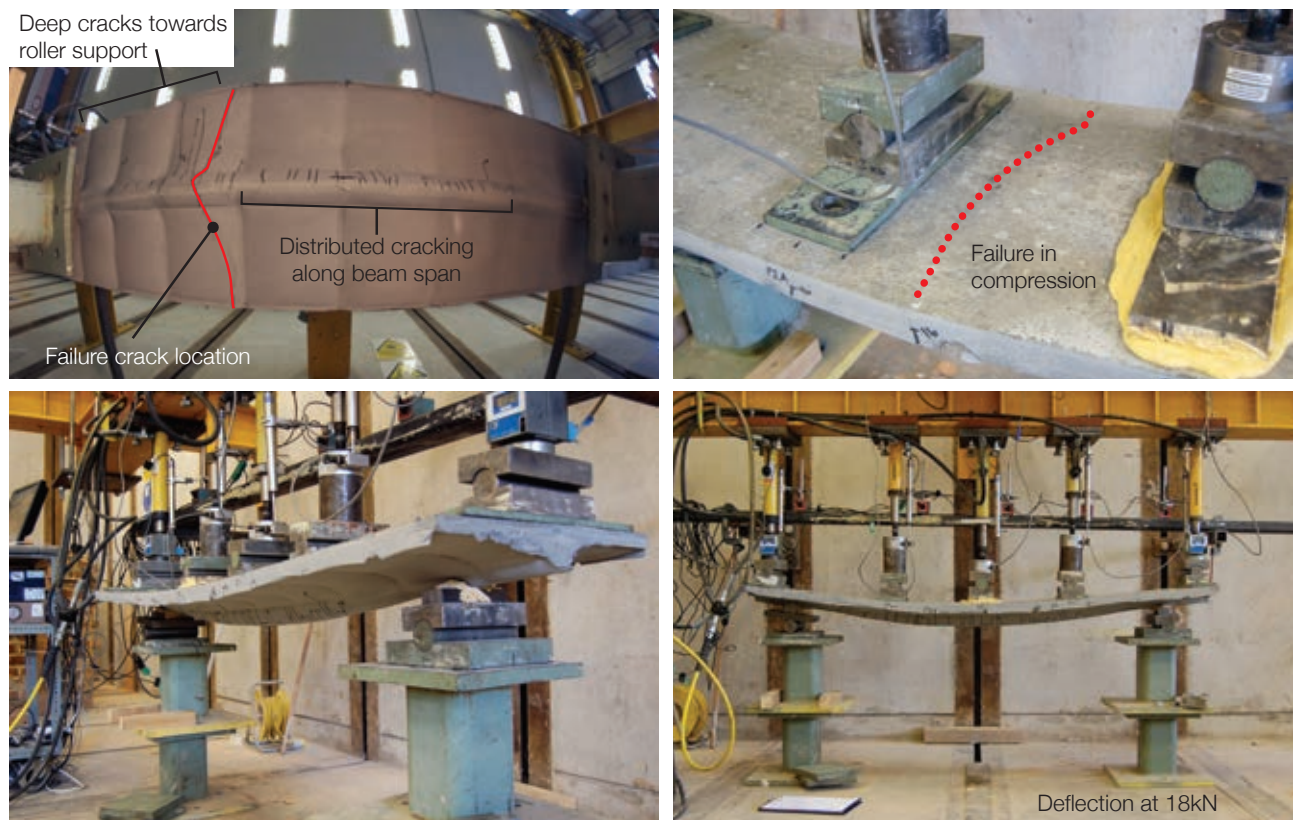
Failure mode and photographs - Beam 7\_3.
